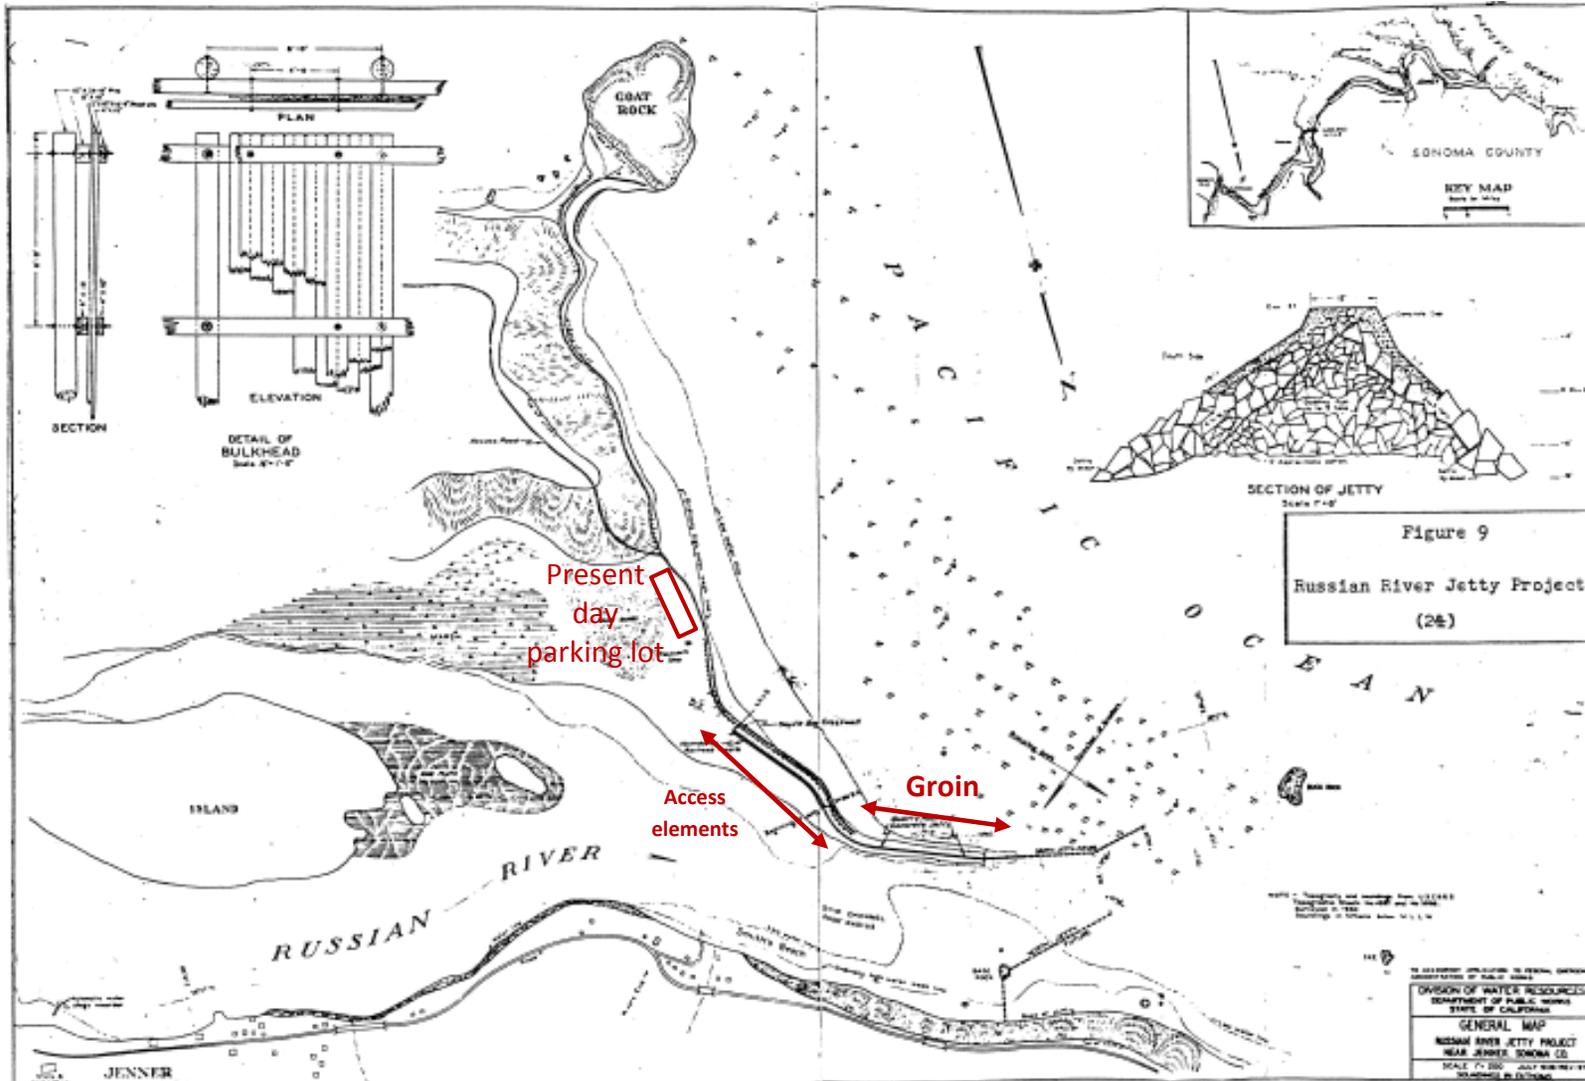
Drawing of Jenner Jetty – Groin, Roadway, Seawall, and Railway
